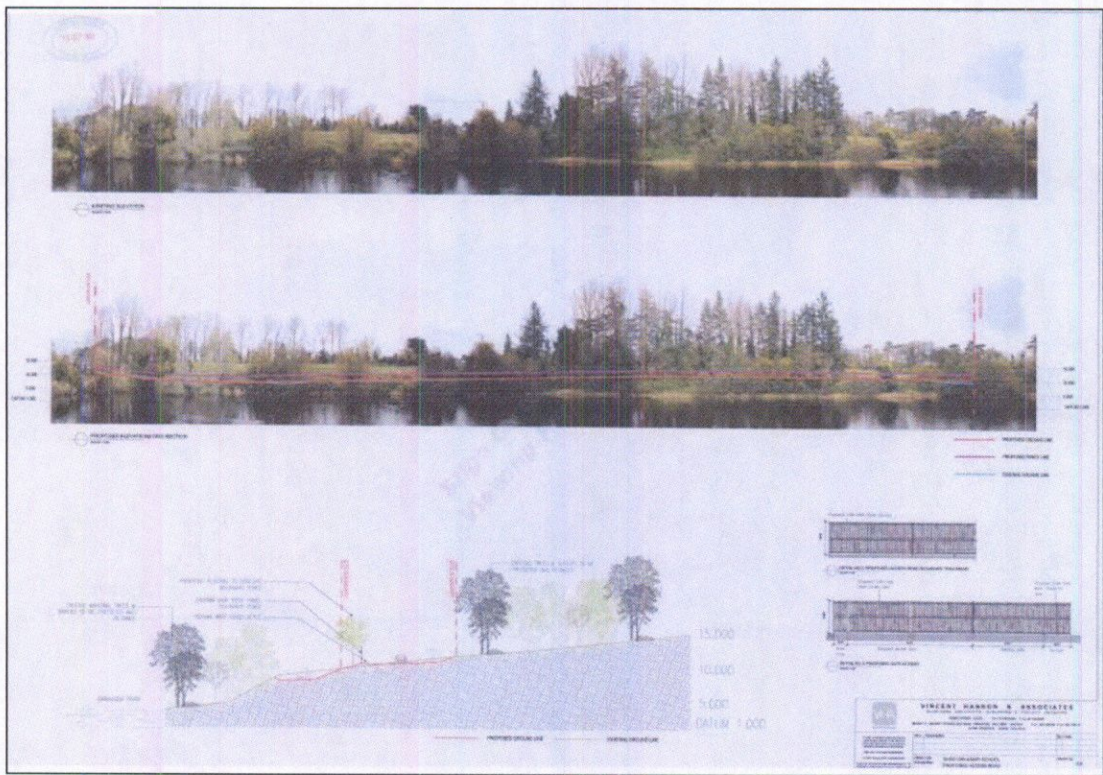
Elevation drawing of proposed road (Source: Envest, 2017).
